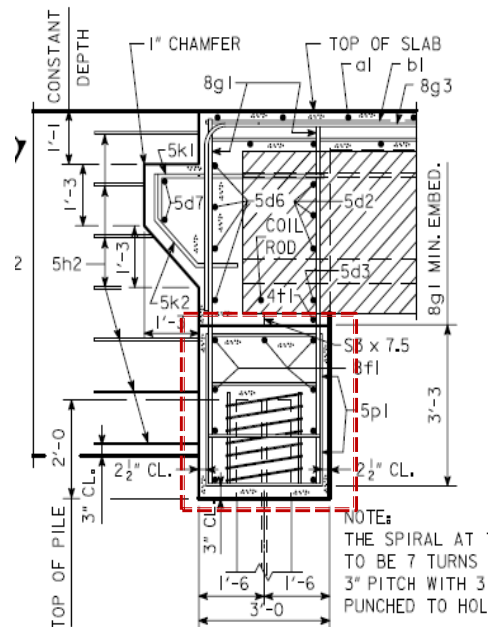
Elevation View of a Typical Integral Abutment Detail (Iowa DOT 2011)
